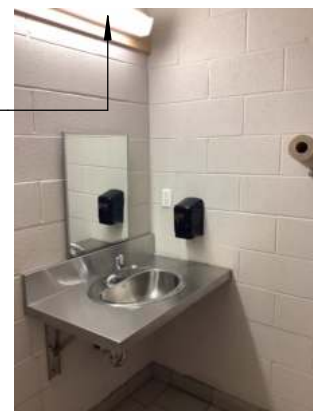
REMOVE EXISTING LAVATORY AND WASHROOM ACCESSORIES
